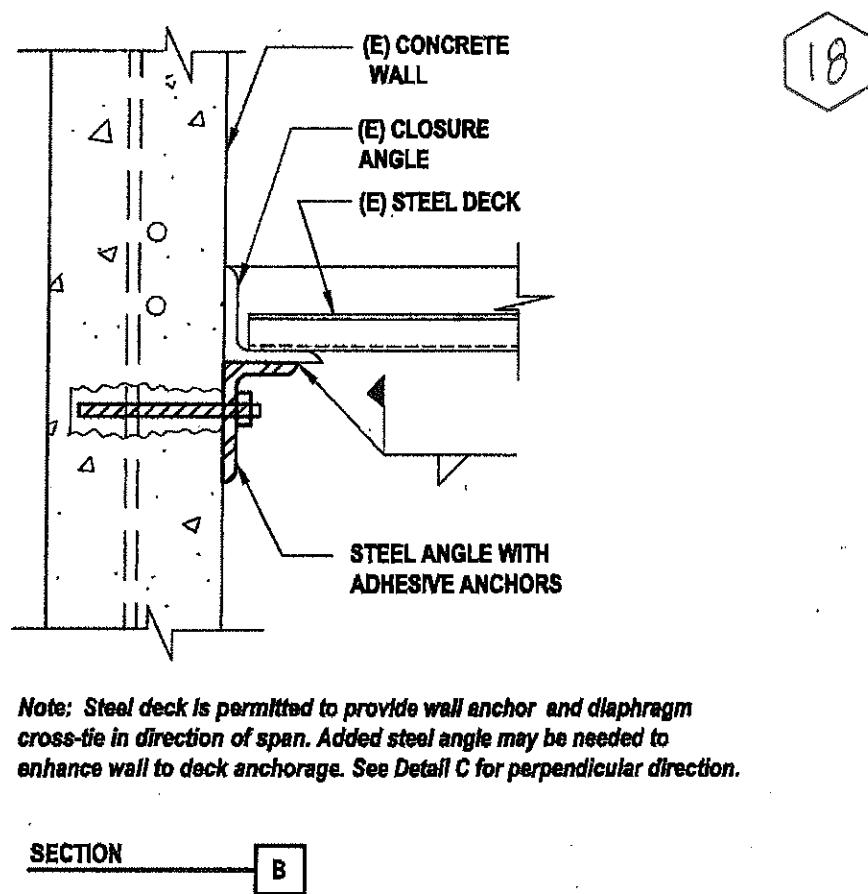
B: Wall Out-of-Plane Anchorage for Flexible Steel Diaphragm
